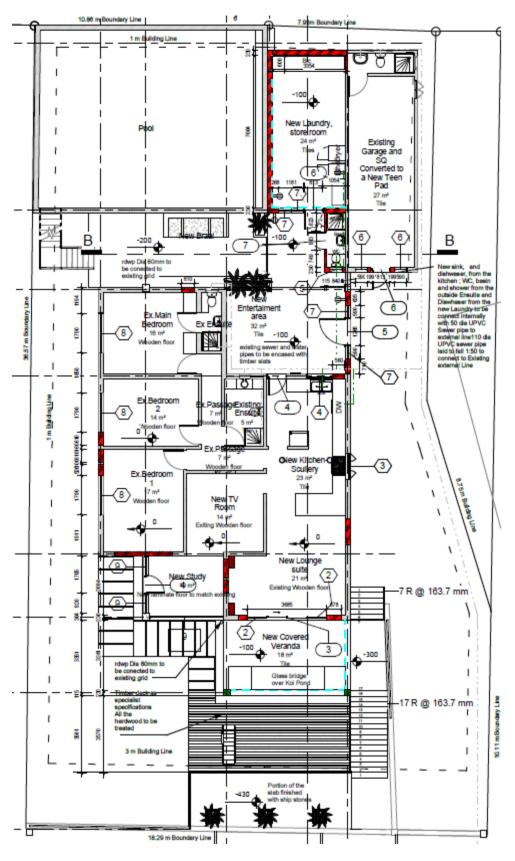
Ground floor plan with the Addition and alteration Proposal. (From Submission Plan)
